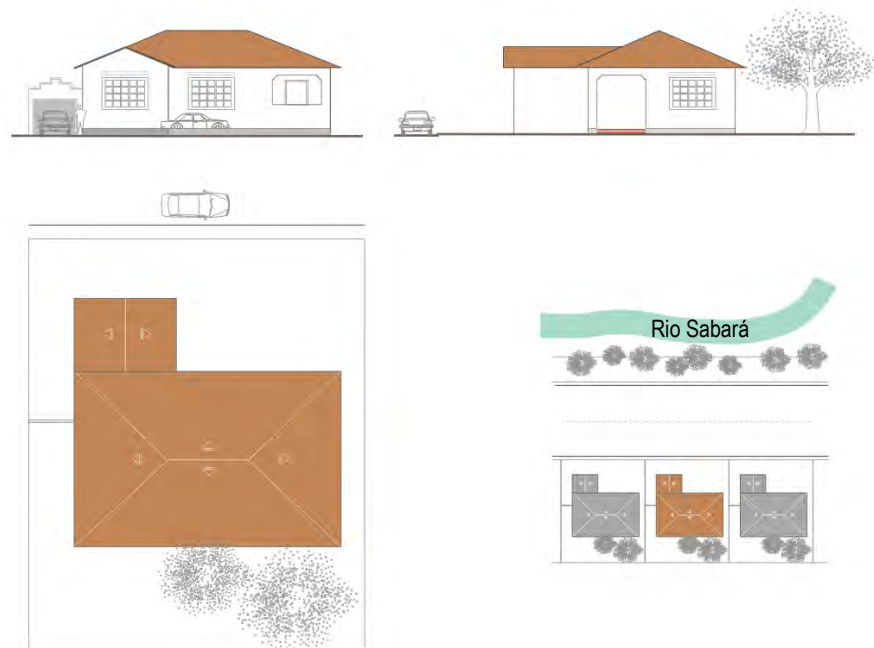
Larger type (engineers's houses). Schema of façades, building implantation and situation. (Source: schemas produced by the authors, no scale).
